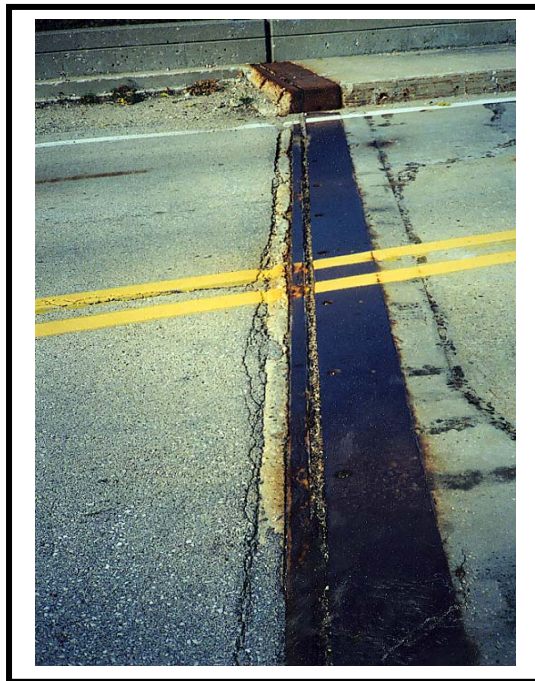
3-52: Transverse Joint with Deck Cracks Suggesting a Failing Anchorage System
